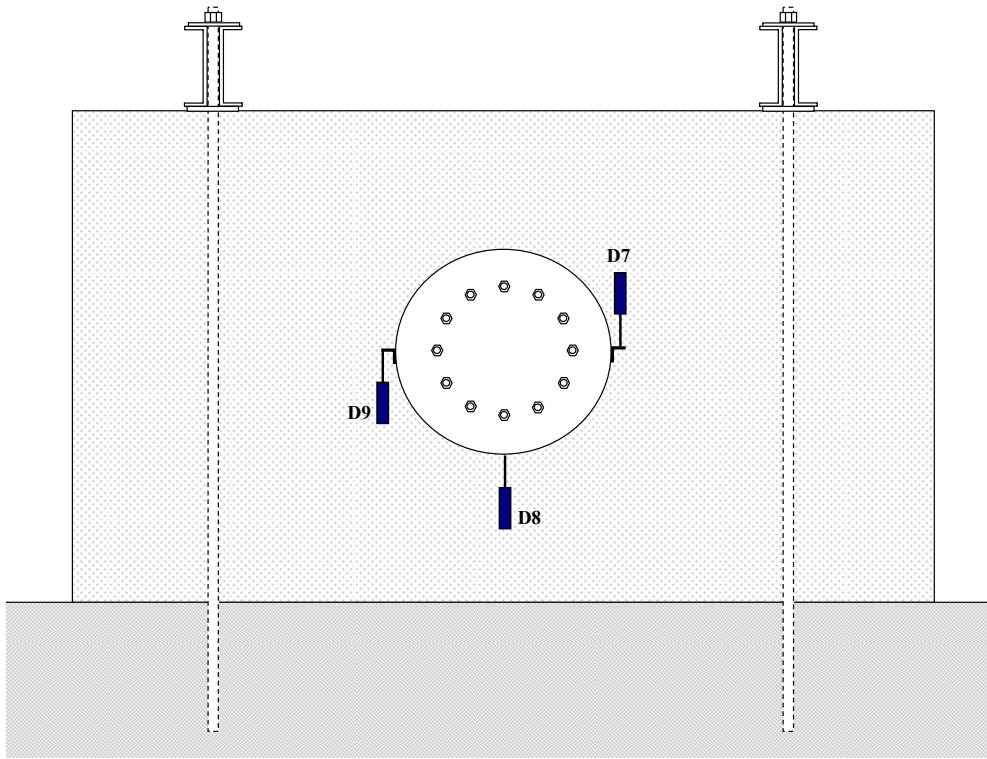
Instrumentation layout on rear of shaft/face of concrete block
